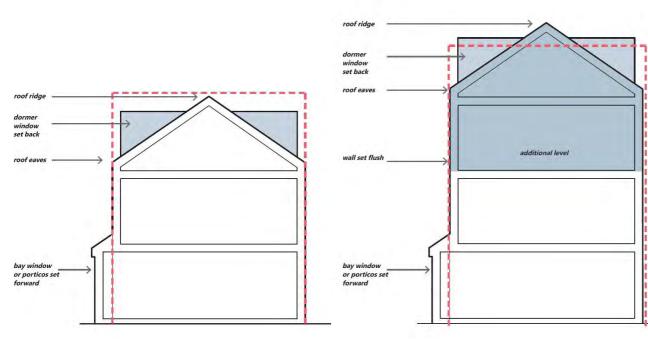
Section of dormer roof extension showing windows set back from the eaves and set in from the party wall.
